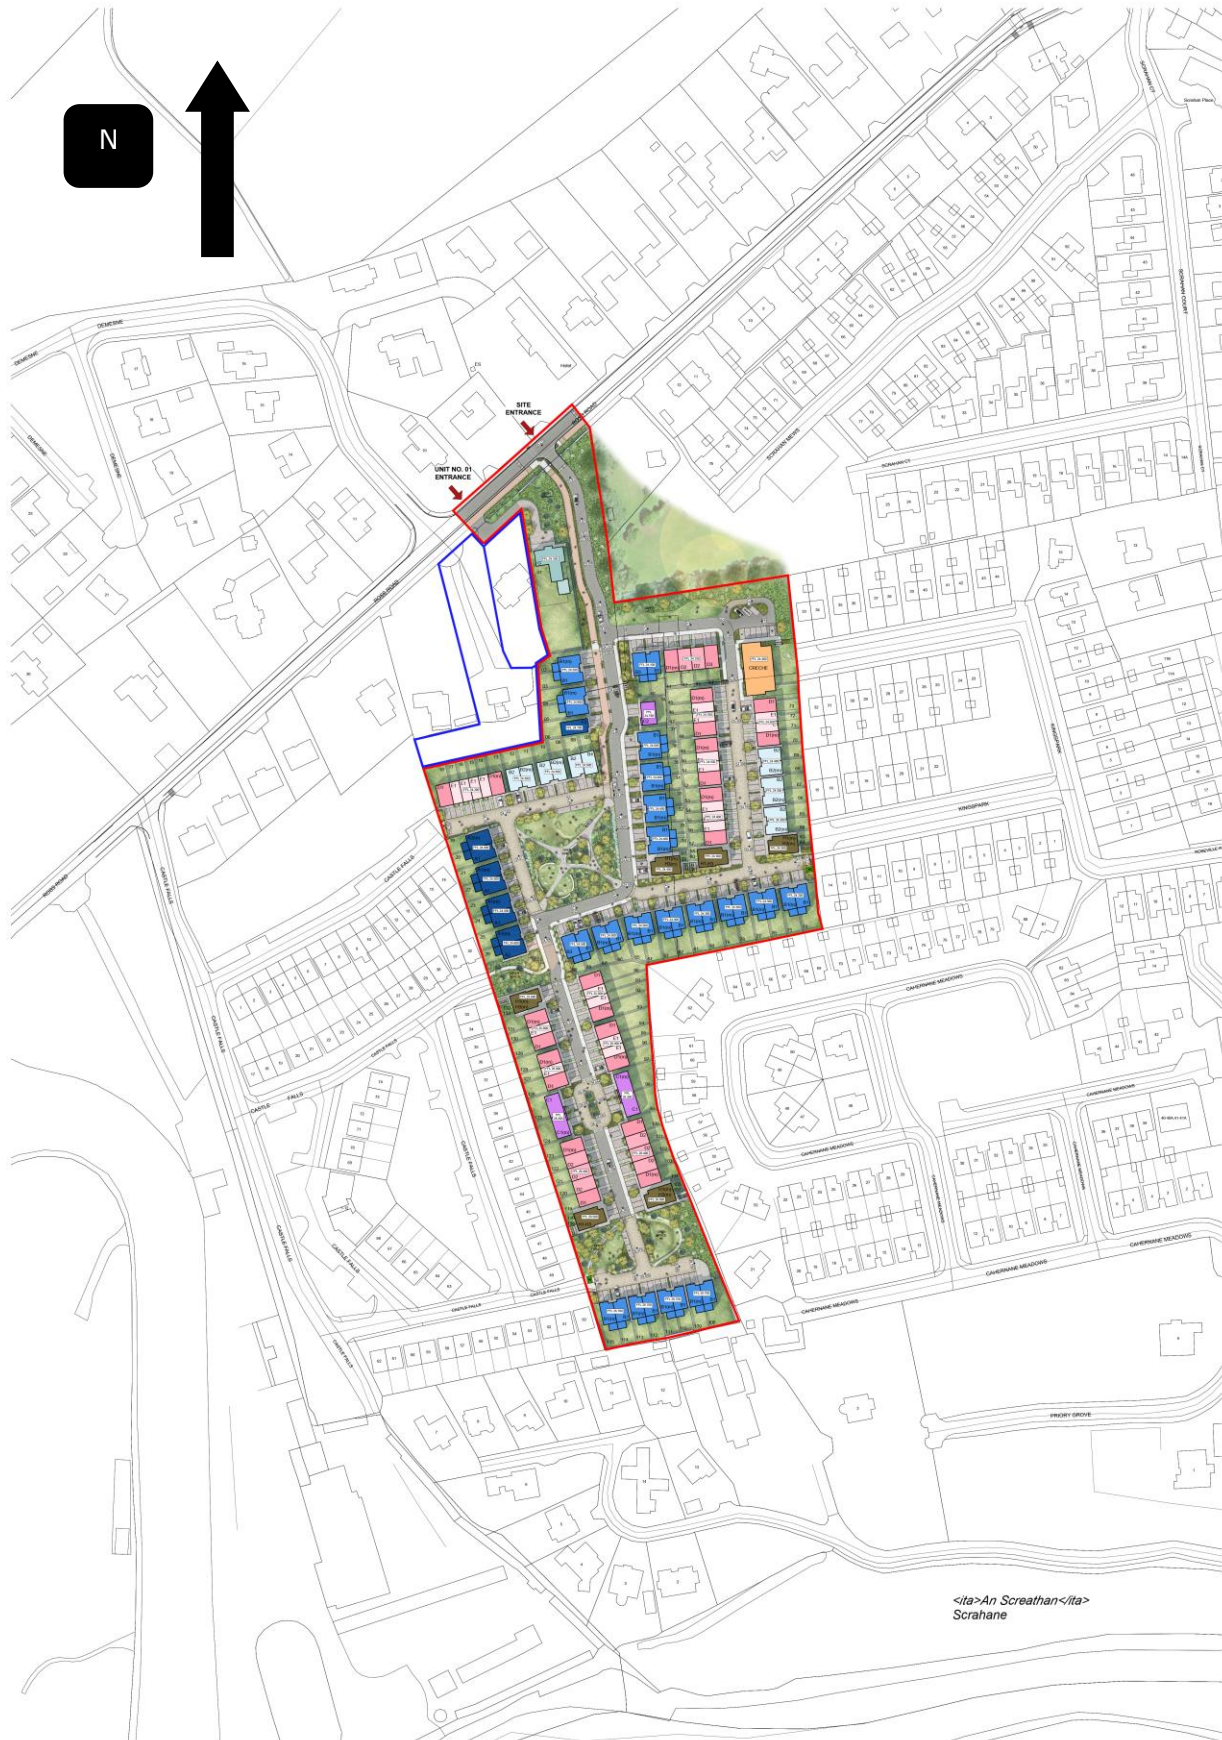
Site Layout Map (Credit: Deady Gahan Architects)
